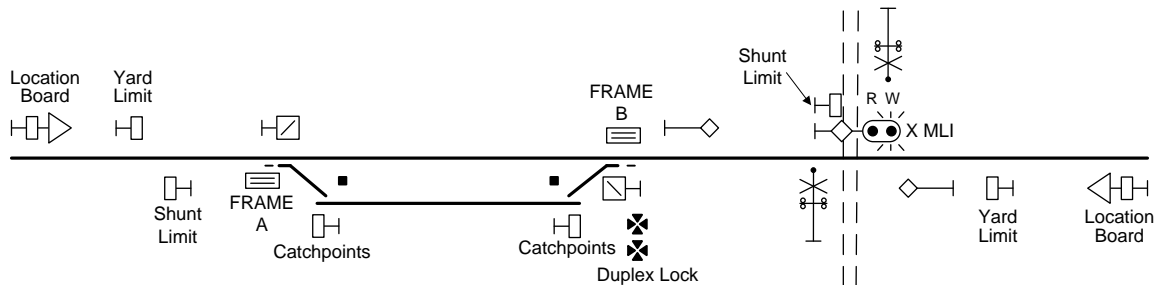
B: LEVEL CROSSING ADJACENT TO A TRAIN ORDER LOCATION ALTERNATIVE ARRANGEMENT
